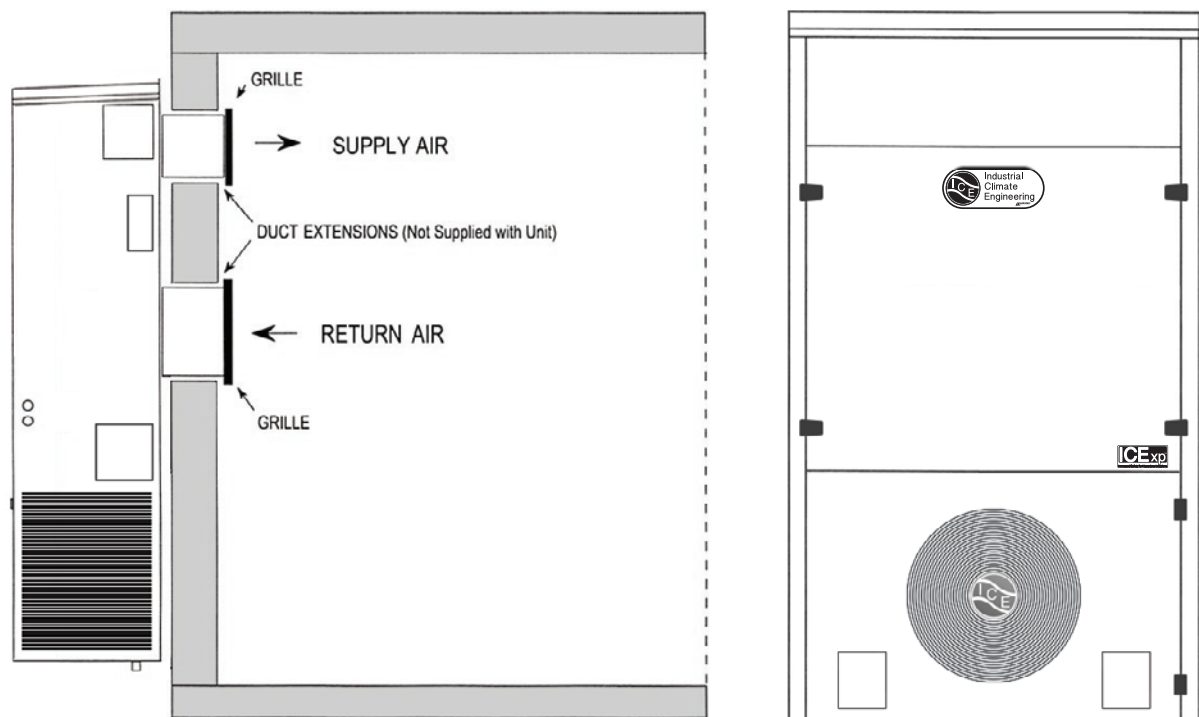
EXNA/EONA90/120/150 Air Conditioner Wall Mount Detail
